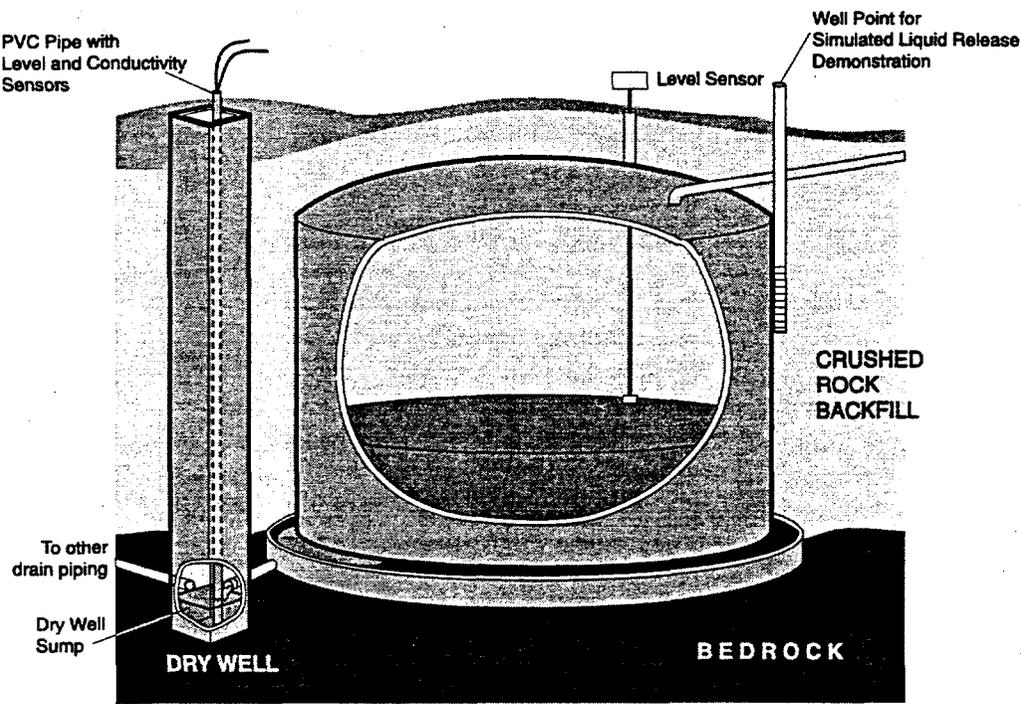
Typical gunite tank, dry well and tank pad construction.
